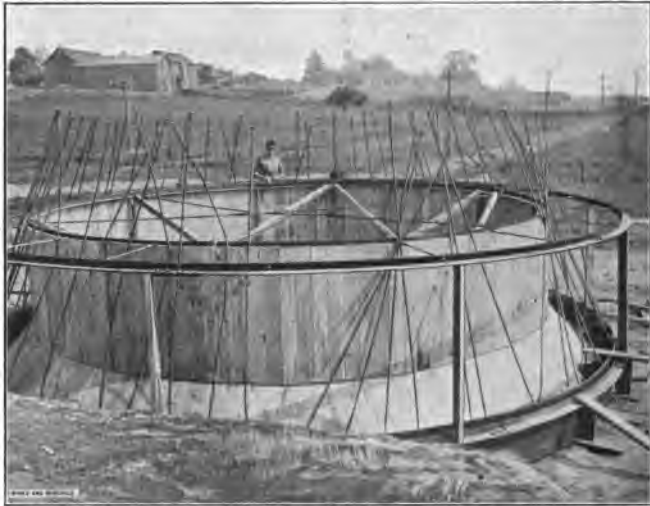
Shoe, Lower Part of Form, and Reinforcement, Rondout Caisson
